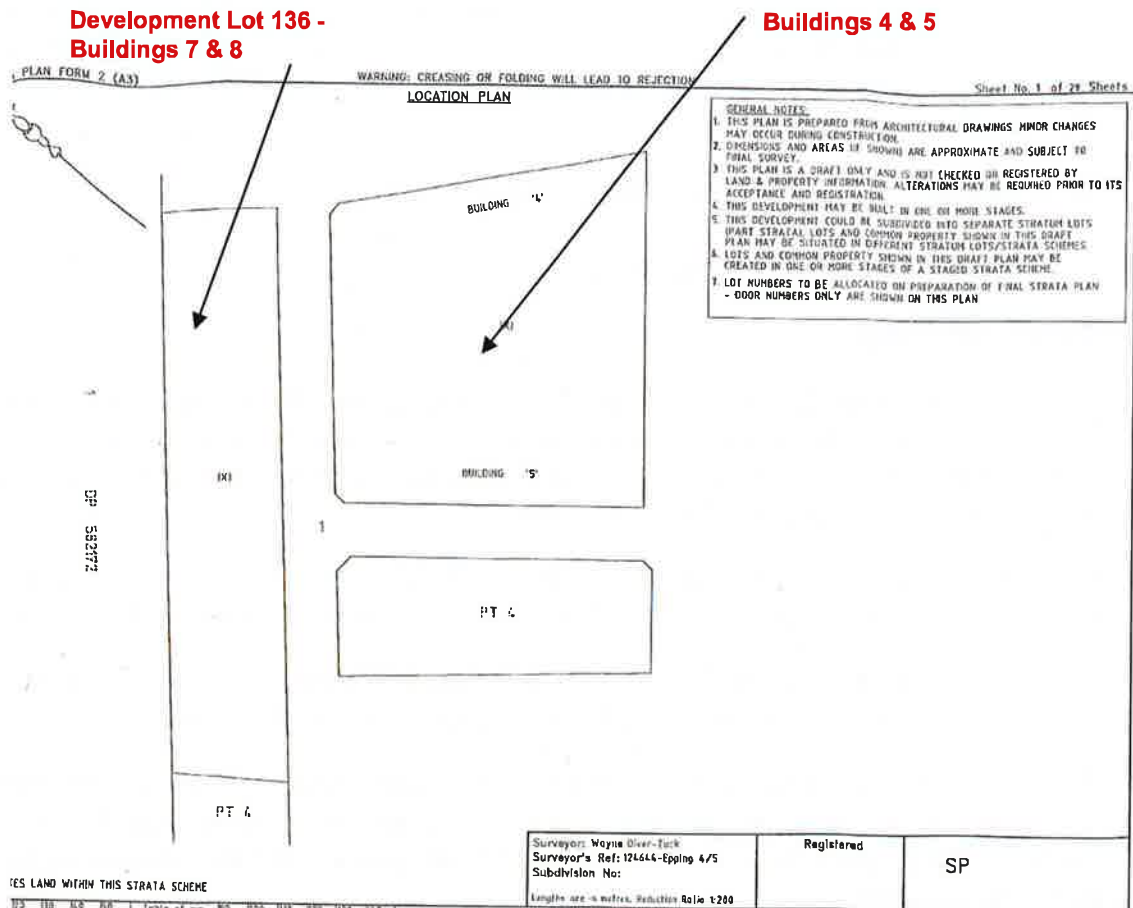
Location plan of buildings 4 & 5 and development lot 136
